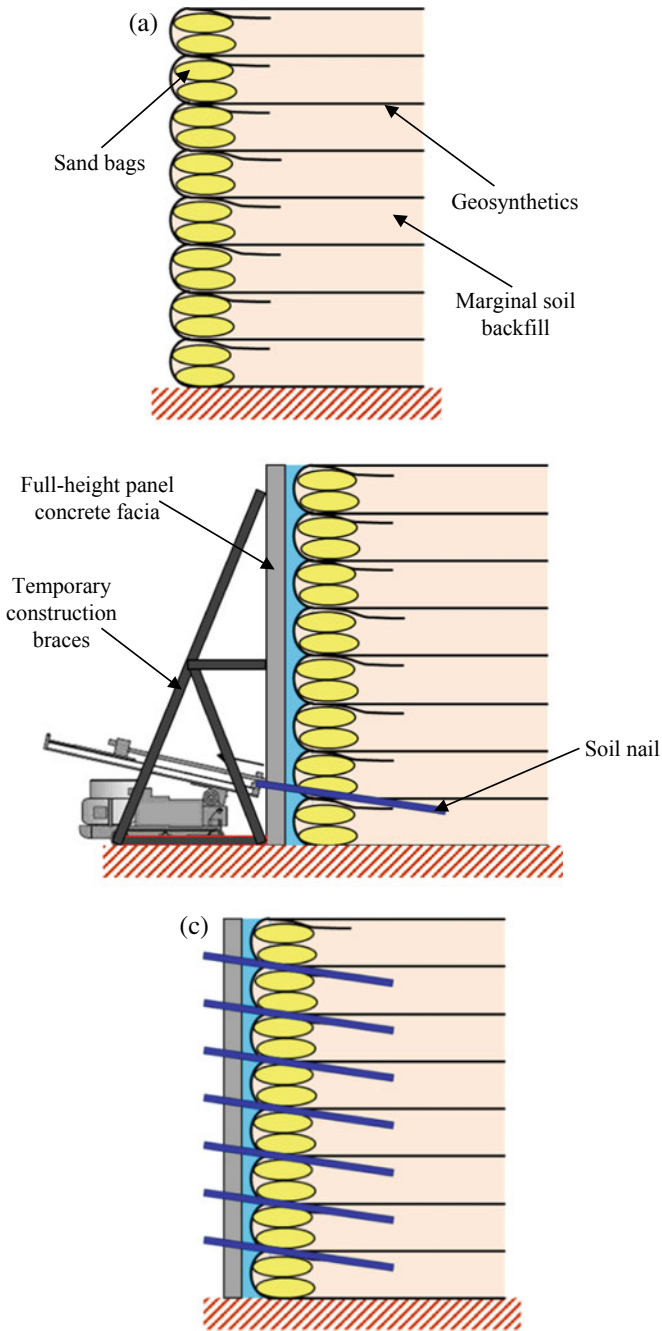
Proposed construction sequence of new facia system: a Step-1, b Step-2, c Step-3
